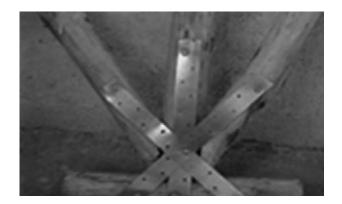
How to fix the strapping to reinforce roofing structure connections.
